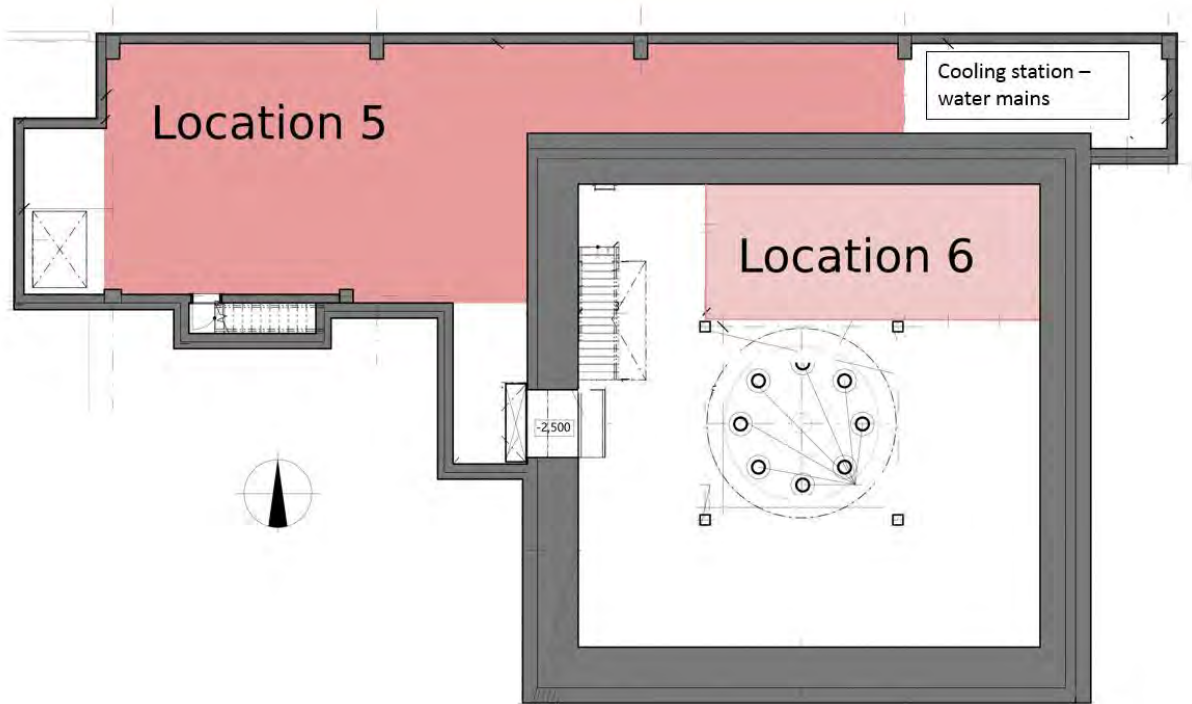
Plan of the underground floor at IPP (Client) site with highlighted possible locations for placement of the Power Supply System components.
